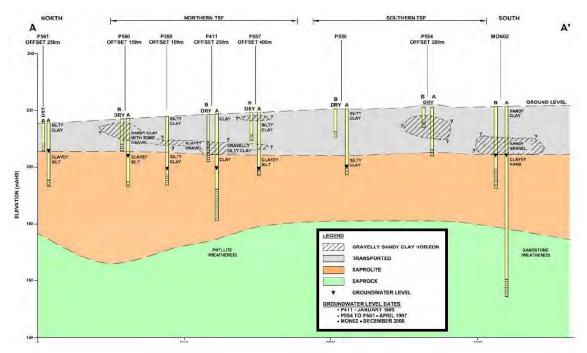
Section A-A' through Northern Tailings Storage Facility and Southern Tailings Storage Facility
